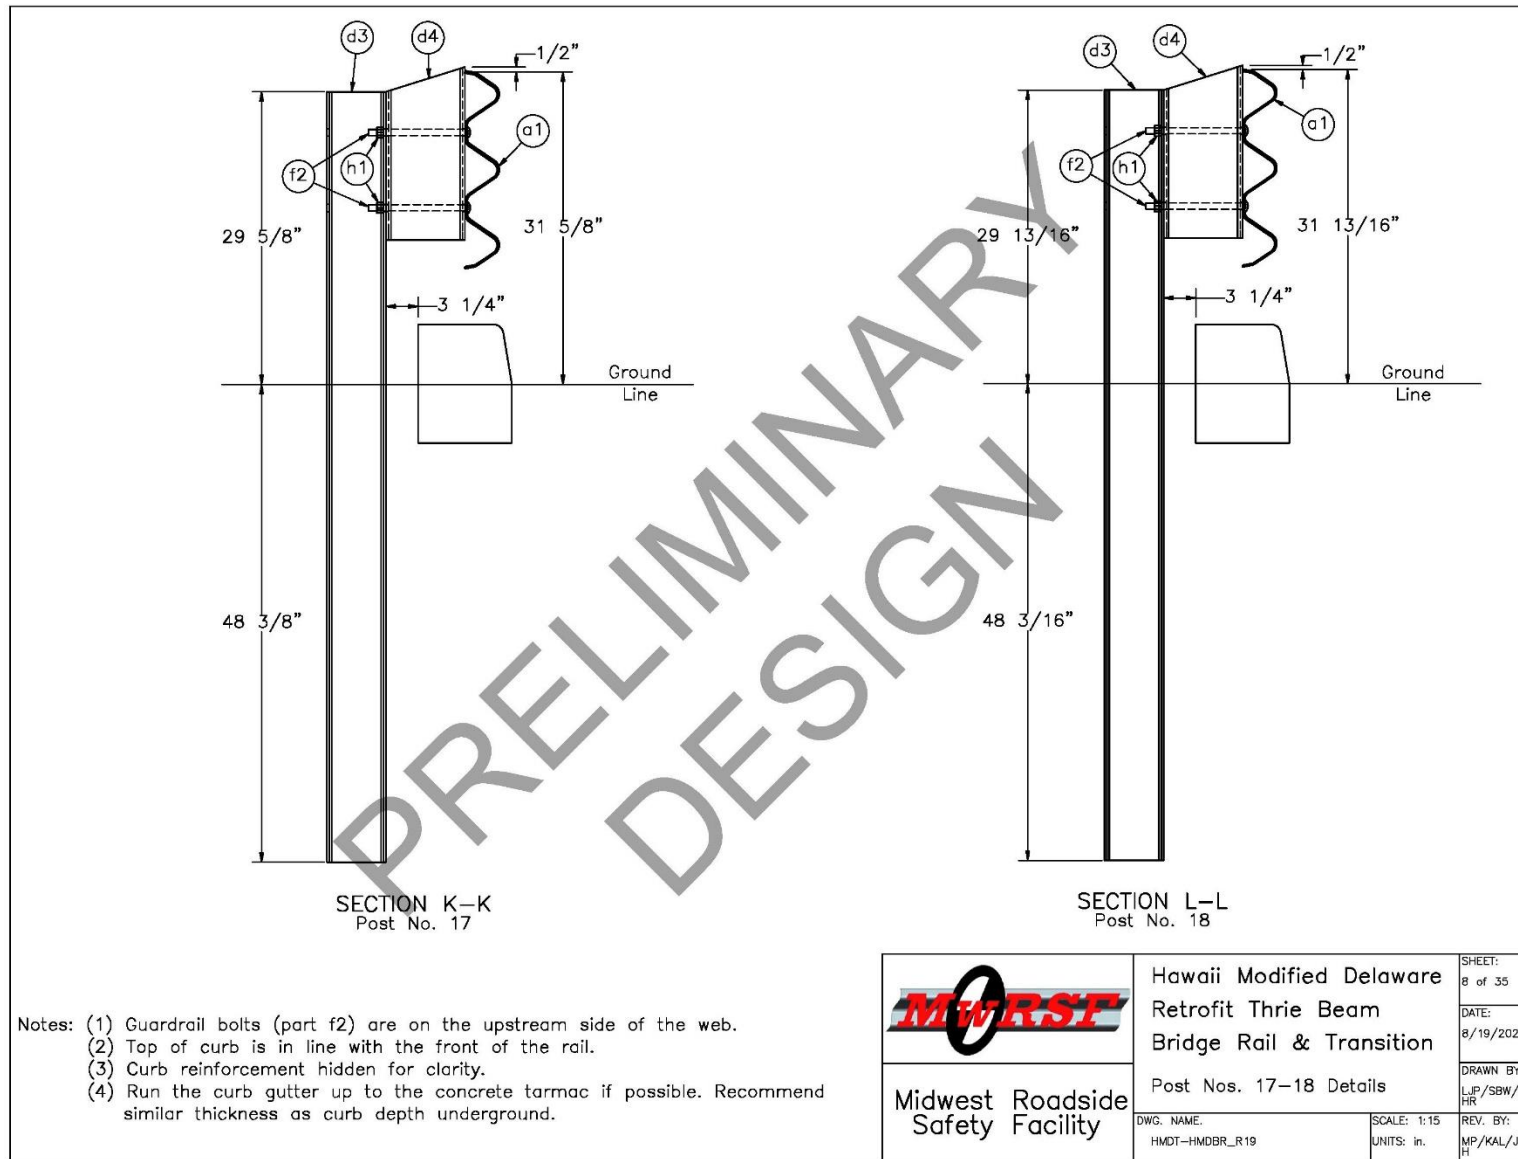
Post Nos. 17 and 18 Details, Test No. HMDT-1
